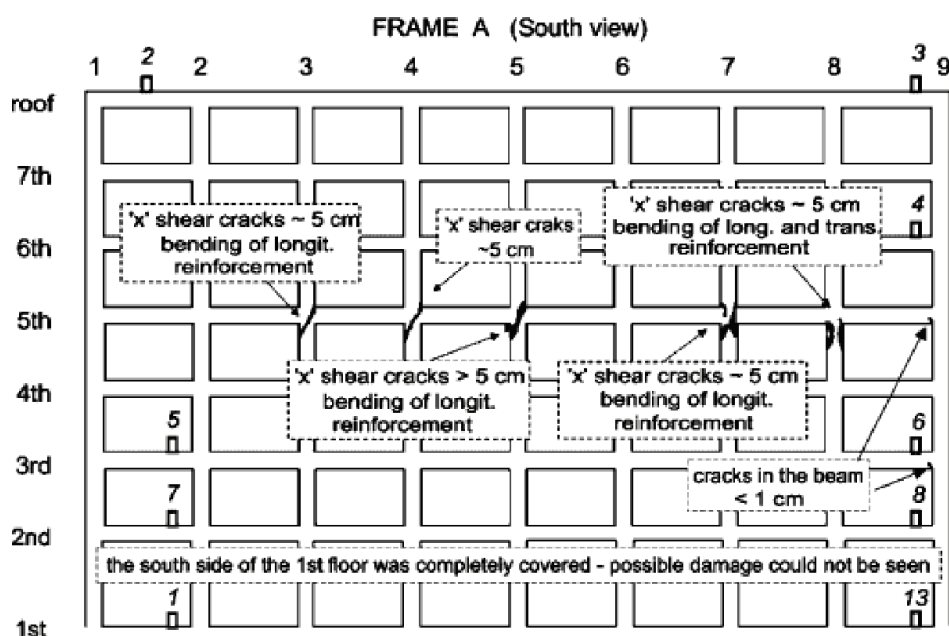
Structural damage to south perimeter frame after 1994 Northridge Earthquake (Trifunac et al., 1999).
